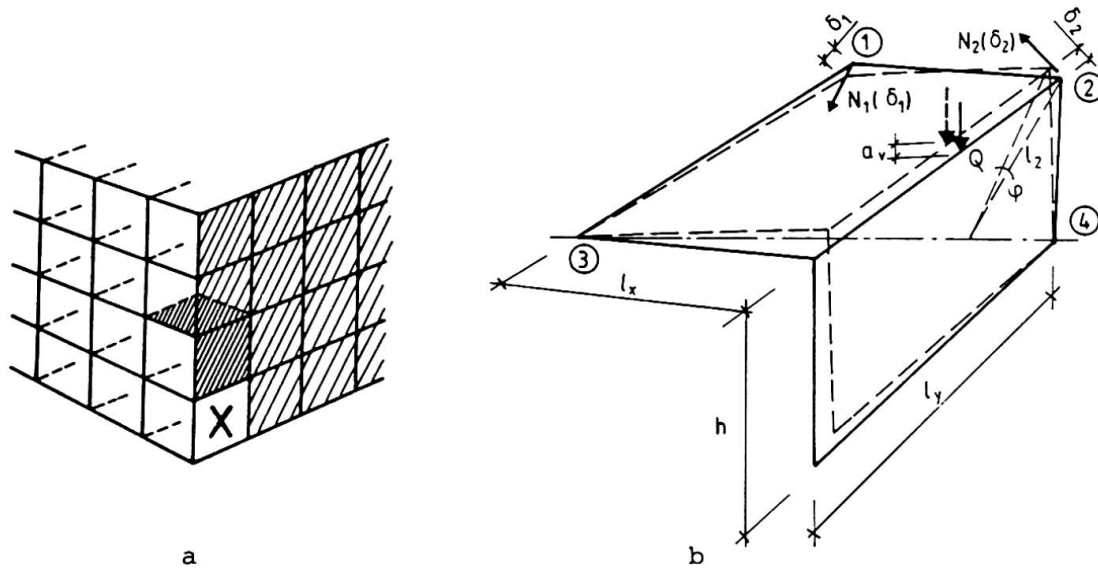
Example of an alternative load-bearing system acting as a composed cantilever above the damaged area
